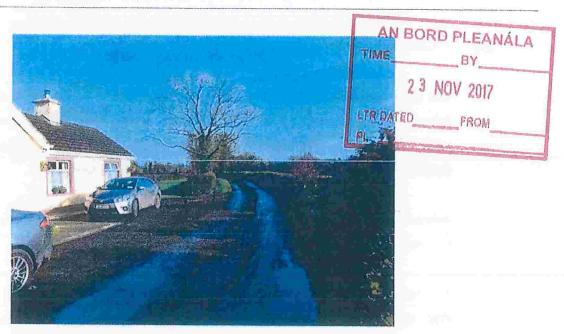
Brennan's dwelling directly facing onto laneway with minimal setback.
